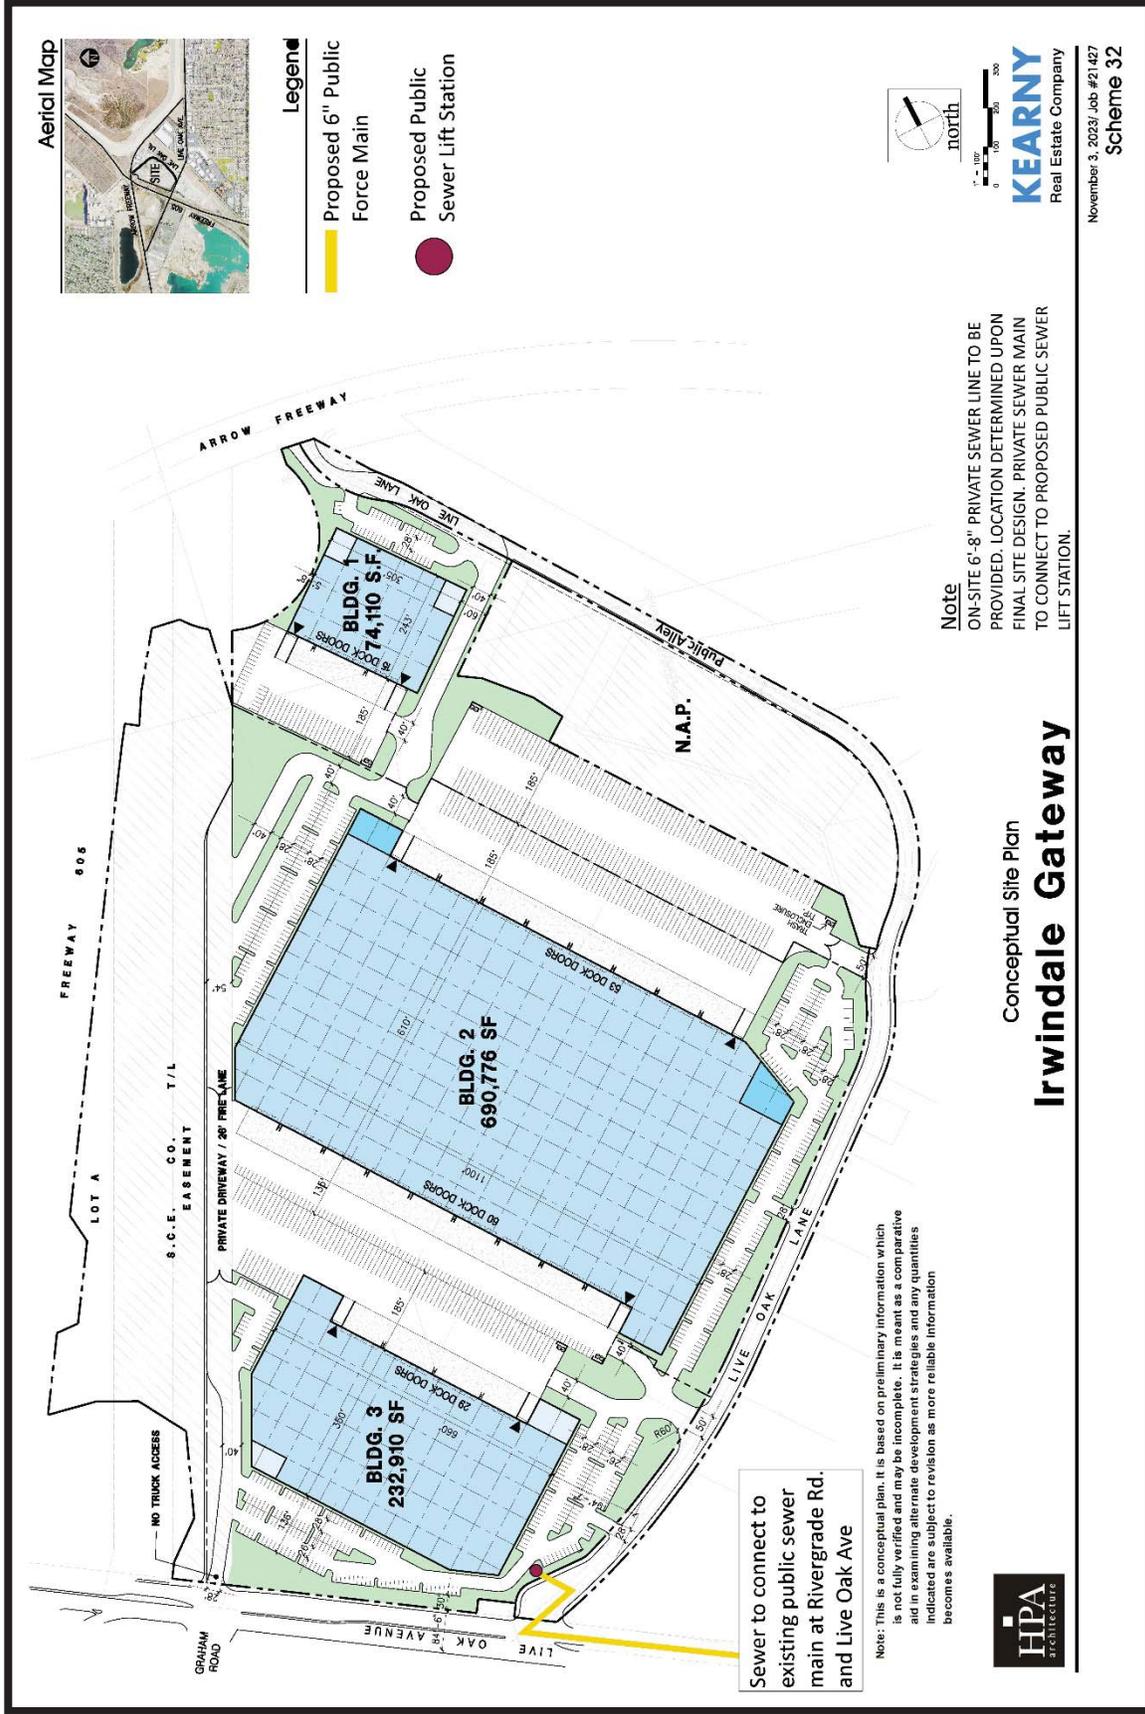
CONCEPTUAL SEWER PLAN WITHOUT BESS
